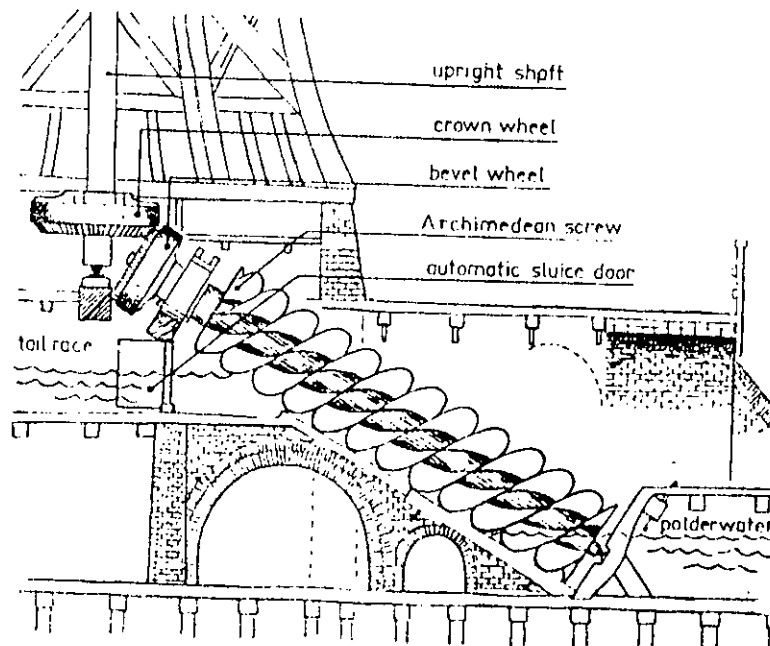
B : Arrangement showing method of driving the Archimedean screw of a drainage mill.
